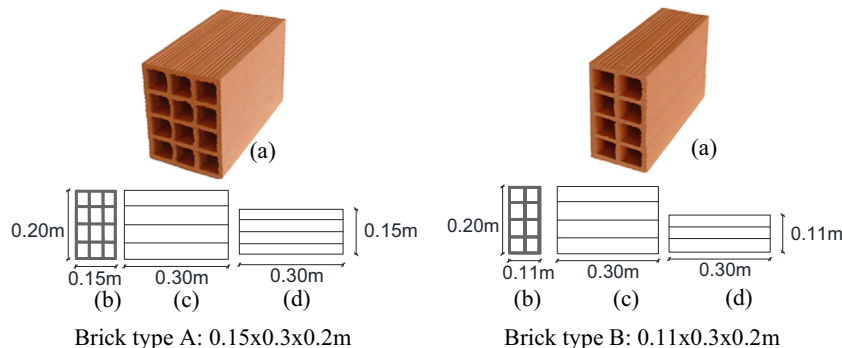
Brick type geometric dimensions (in m): (a) brick general view, (b) front dimensions, (c) lateral dimensions and (d) upper dimensions.
